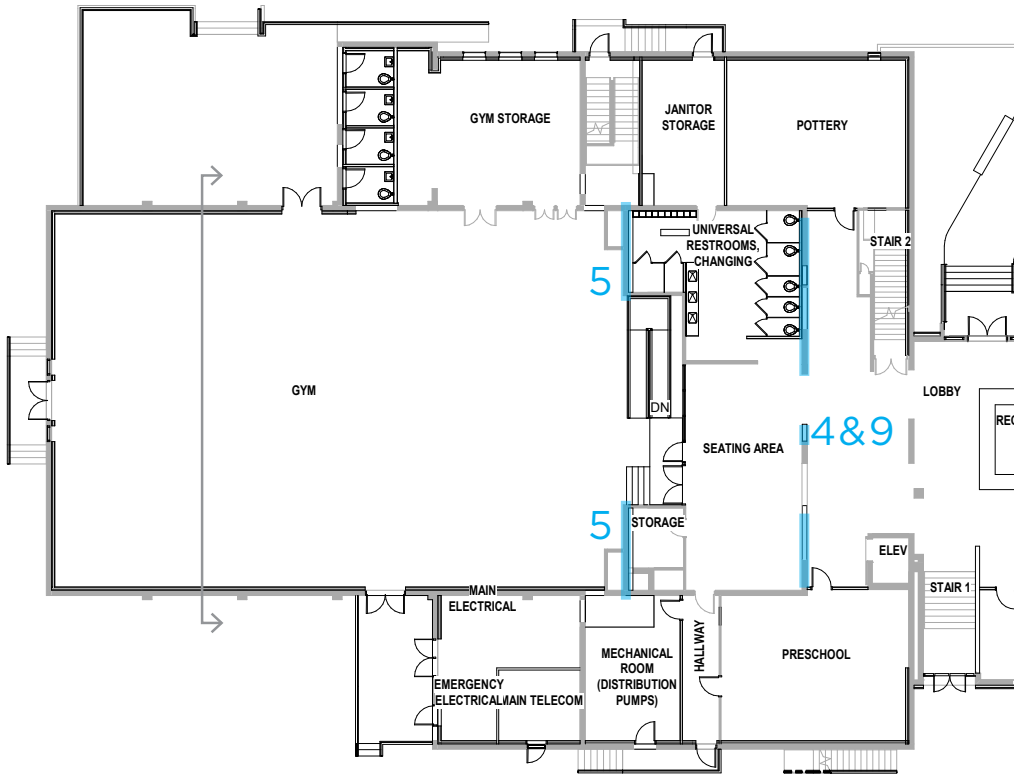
Section drawing of structure at gymnasium space showing locations for plywood sheathing and wall anchors.
